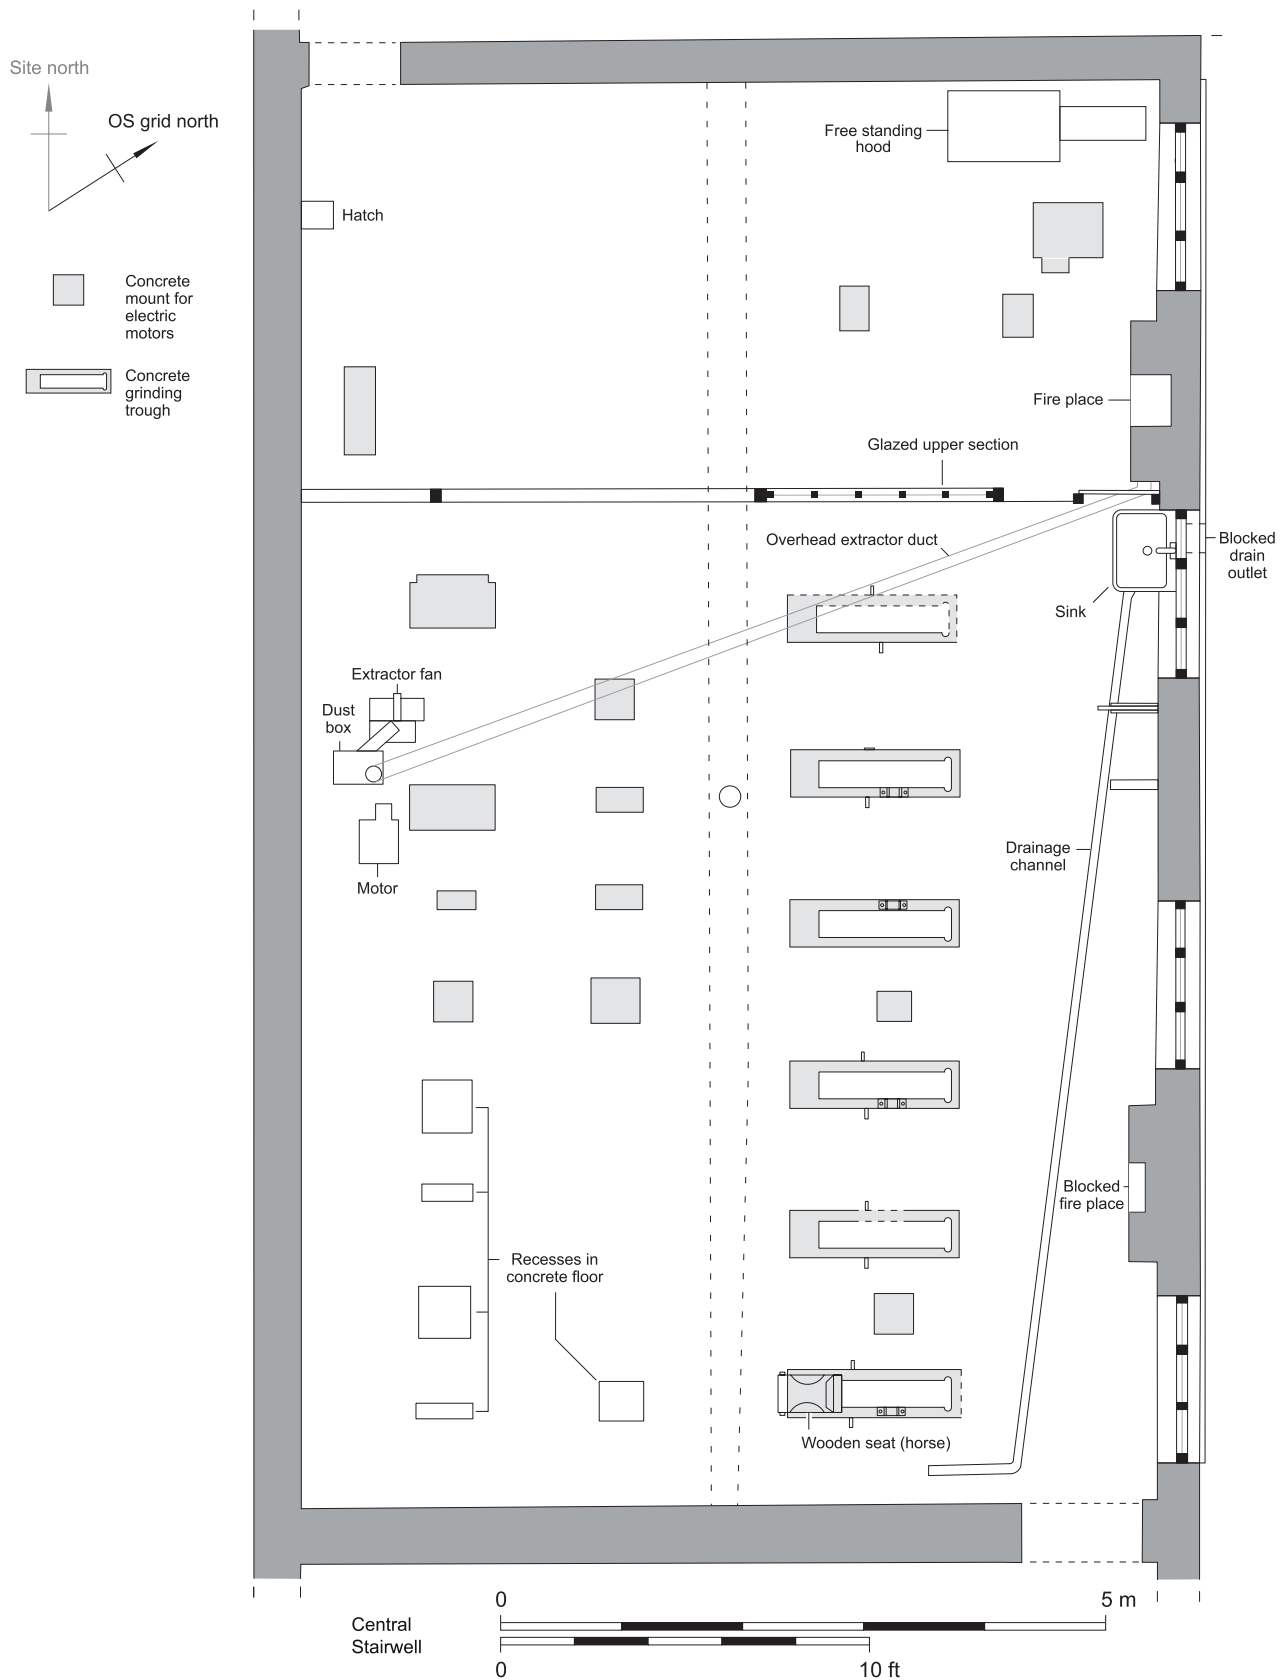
Floor plan of north grinding workshop with concrete troughs, second floor, West range
